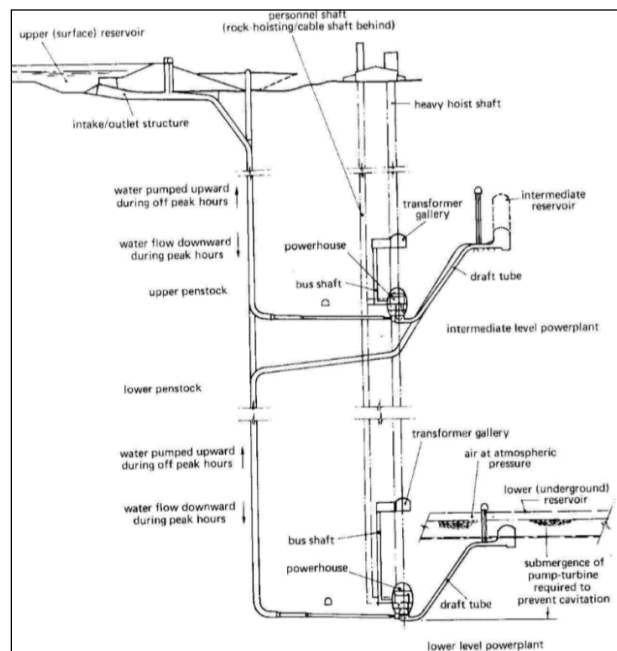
Double-stage Underground Pumped Hydro Storage layout from the 1970s [7]
